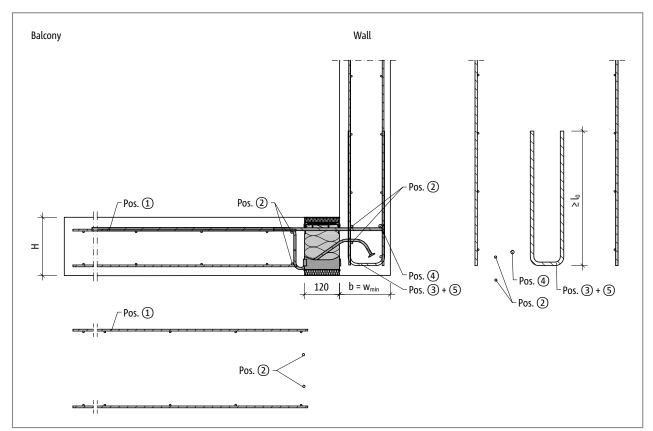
Schöck Isokorb® XT type K-U: On-site reinforcement for wall connection upwards with minimum structural element dimension (wvorh = wmin)
